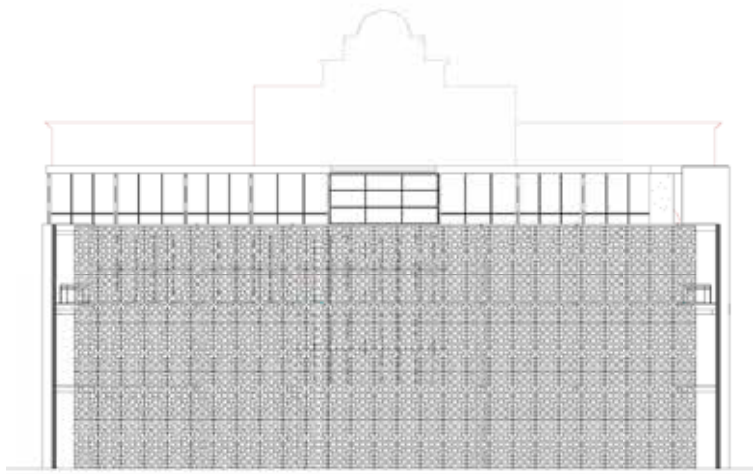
LAKSHMI BUILDING - NORTH ELEVATION - Scale 1:500.
